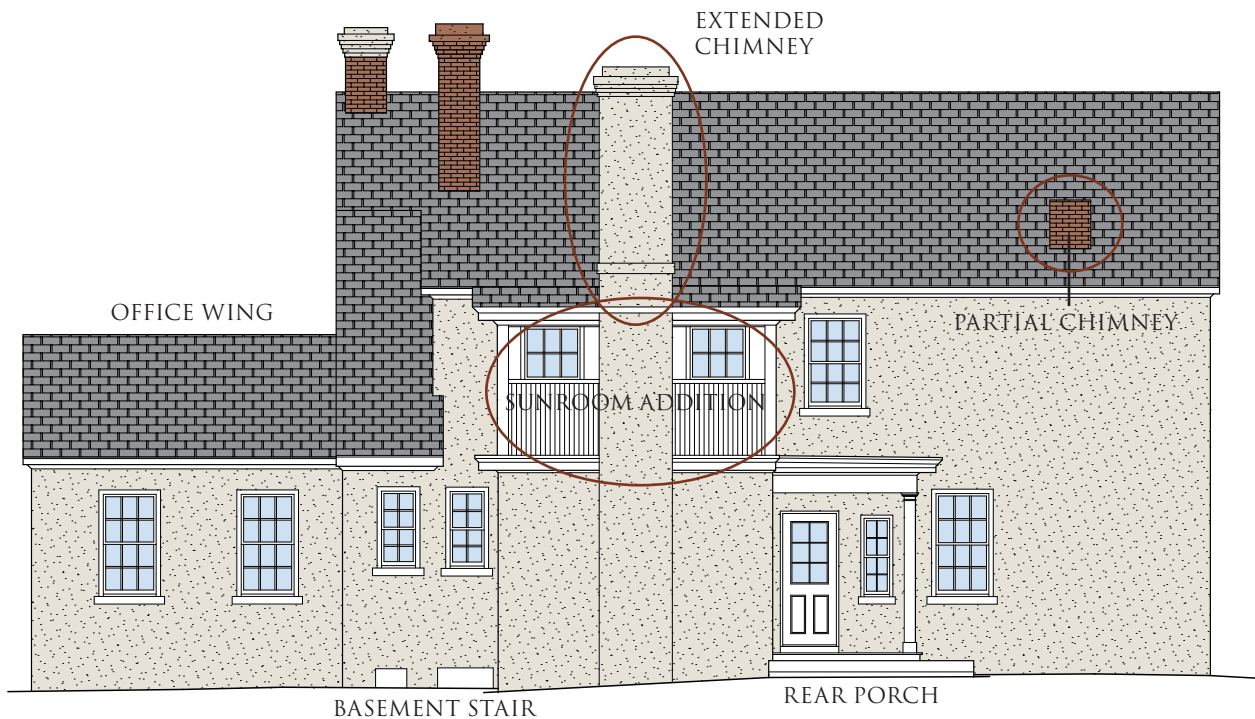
In addition to the sunroom addition, this elevation shows the loss of a portion of the chimney that served the living room.
